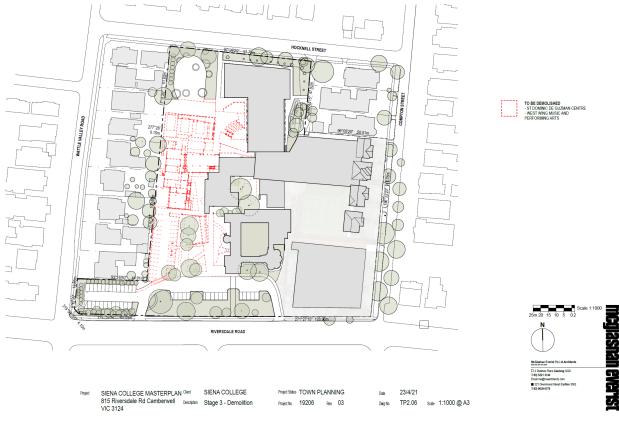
Proposed Stage 3 demolition works. (McGlashan Everist, 23 April 2021).
